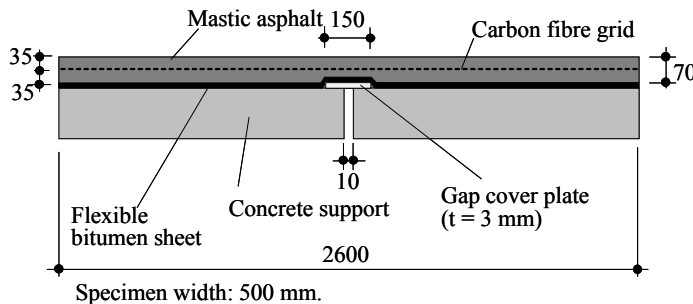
Longitudinal cross section of MA specimens for low temperature tests (units in mm)
